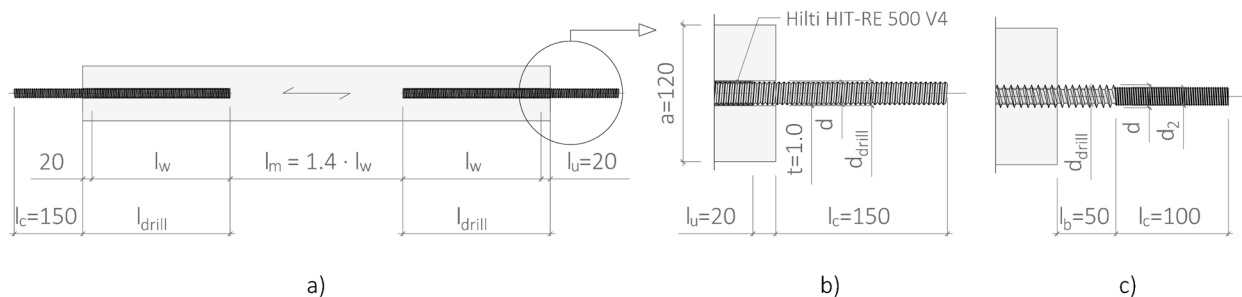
Schematic representation of the test specimens. a) Dimensions of the specimens. b) Detail of the glued-in rods. c) Detail of the threaded rods with wood screw threads. Distances in [mm].
